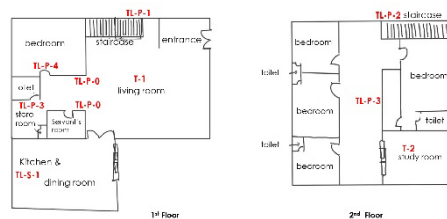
Sketch of the subject's house floor plan and sensors distribution
